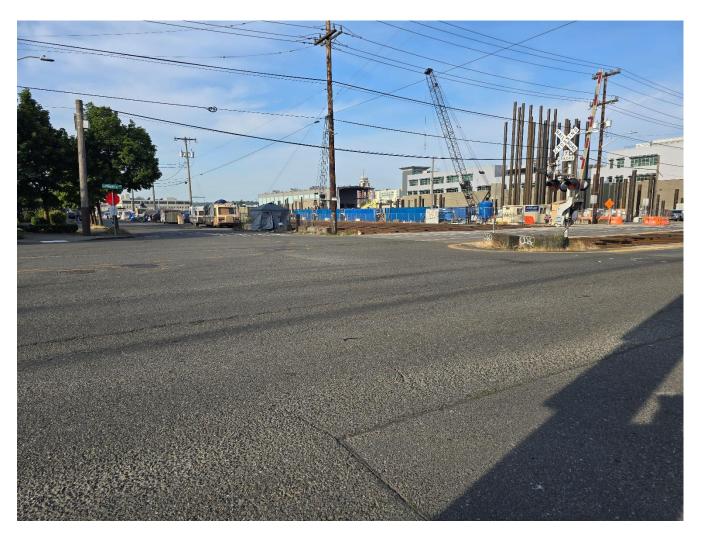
S HOLGATE ST AND 3^{RD} AVE S, NEAR DOT# 927461X, PAVEMENT CONDITION SHOWING LONGITUDINAL CRACKING AND PATCHING, NE CORNER LOOKING SW
